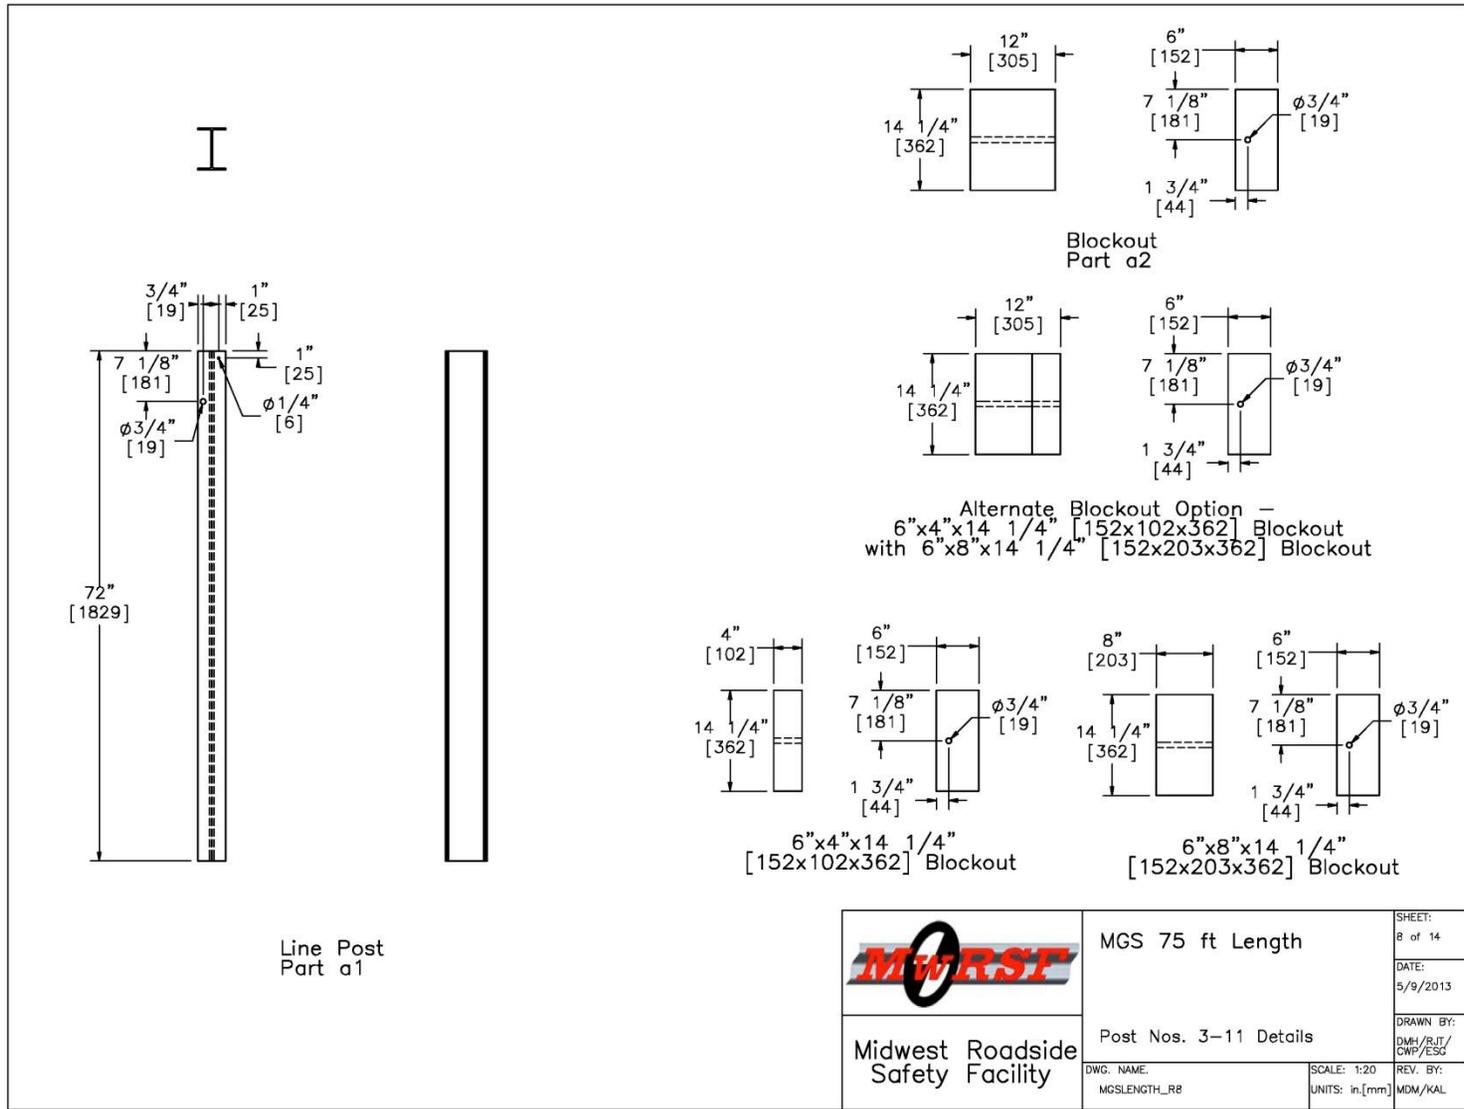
Line Post and Blockout Details, Test No. MGSMIN-1
